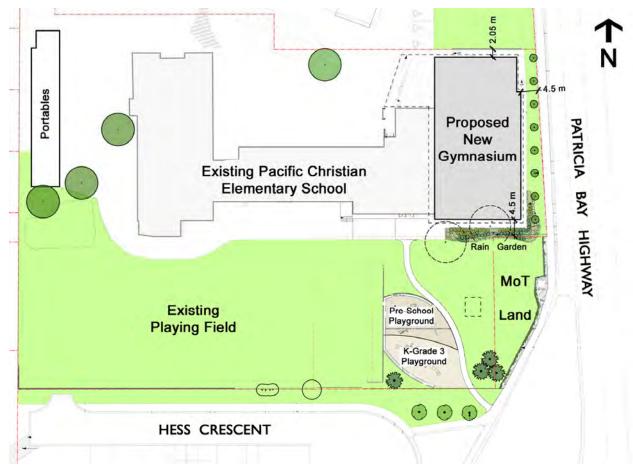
Revised Site Plan (from plans by LADR Landscape Architects)
